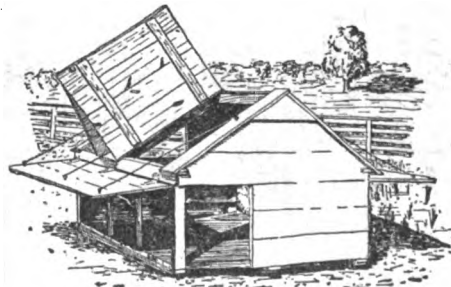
The Iowa Gable Roof movable hog house with sides and roof sections raised to give maximum ventilation and provide maximum shade for summer conditions.
